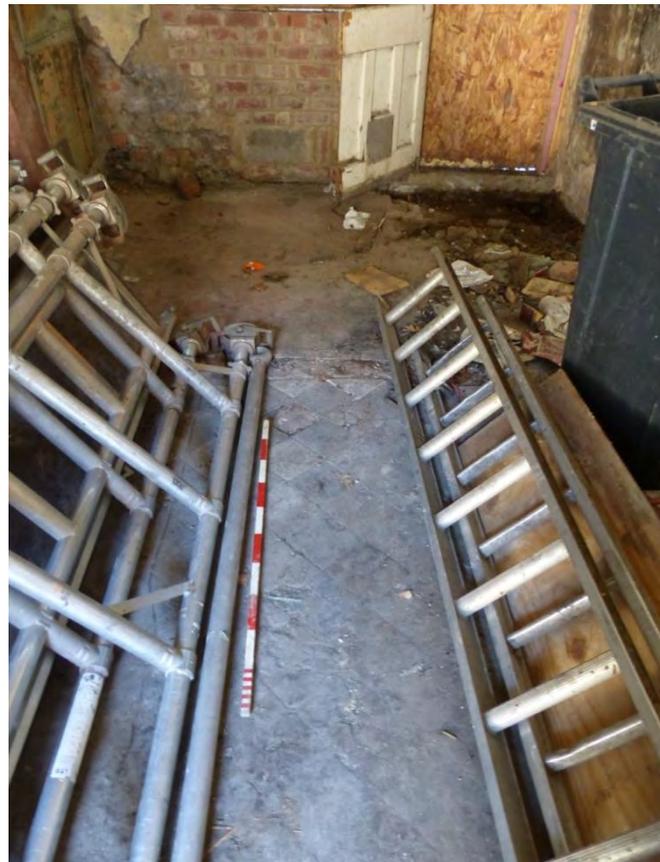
Detail of tiles in the ground floor north room of cottage, looking west
